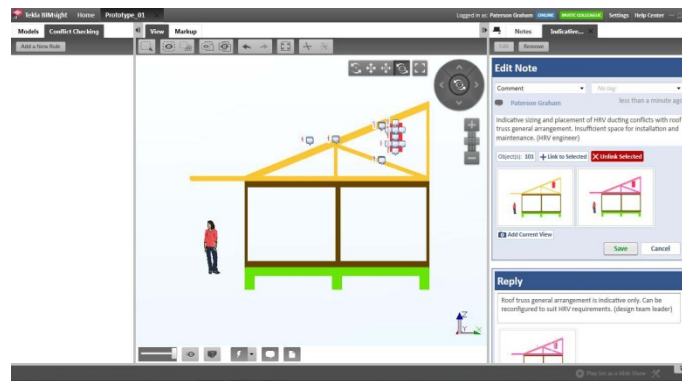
BIM toolkit: orthographic view of suite of federated or reference models showing markup and “first steps” identification and resolution of potential conflicts between building structure and mechanical, electrical + plumbing (MEP) services.
